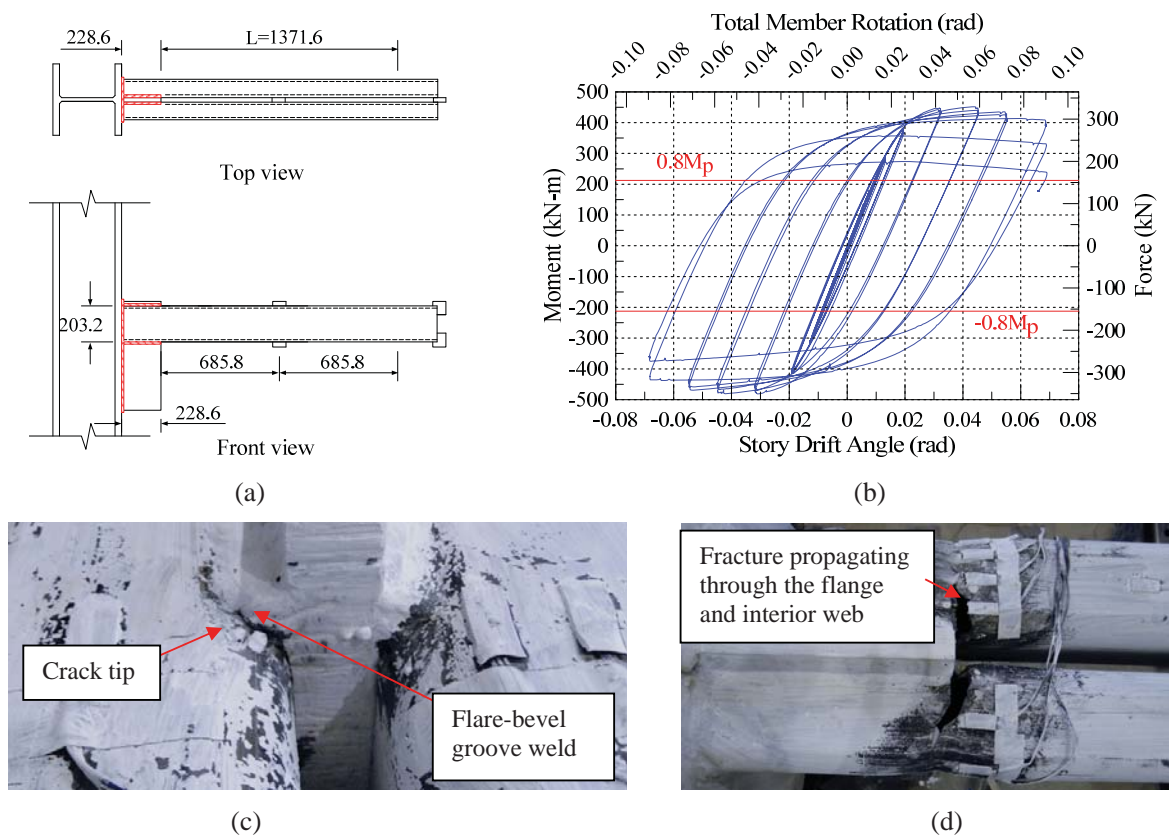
(a) specimen details, (b) hysteresis response, (c) fracture at 0.045-rad SDA, and (d) top view of the specimen at the end of the test
